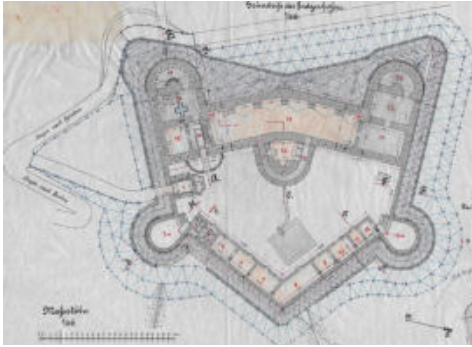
Ground floor plan, Rapports plan from 1902 (War Archive, Vienna)
